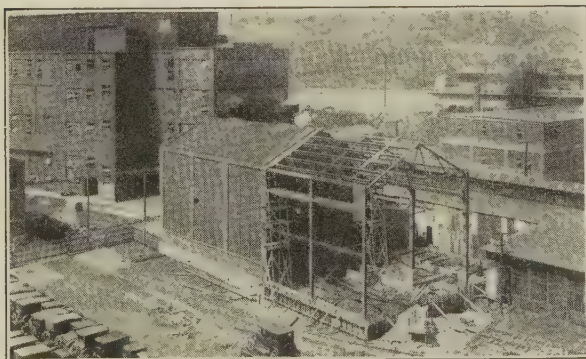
TWO BAYS BEING ADDED BY ARC WELDING TO A SMALL ARC-WELDED BUILDING
